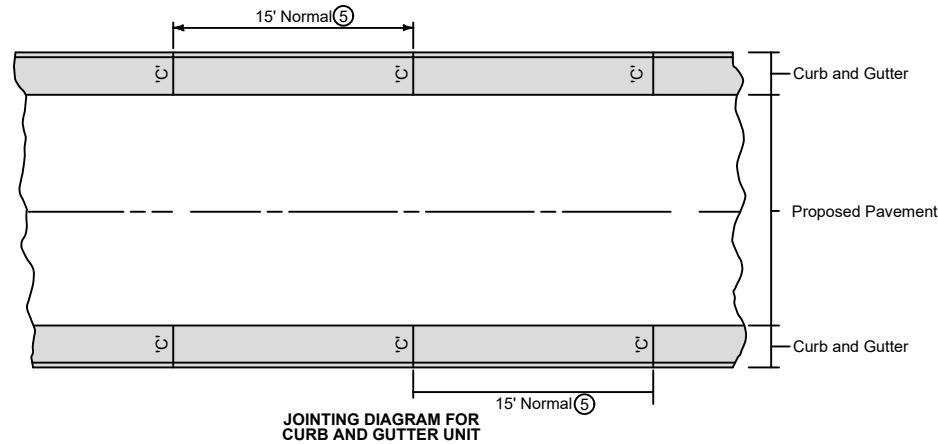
STANDARD ROAD PLAN	REVISION 11 04-19-22
